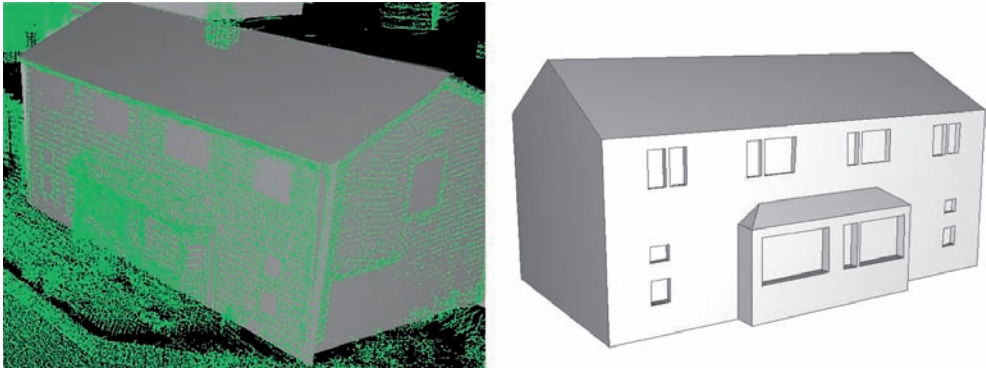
Point cloud with coarse building model (left) and refined building model after recursive facade reconstruction (right).
